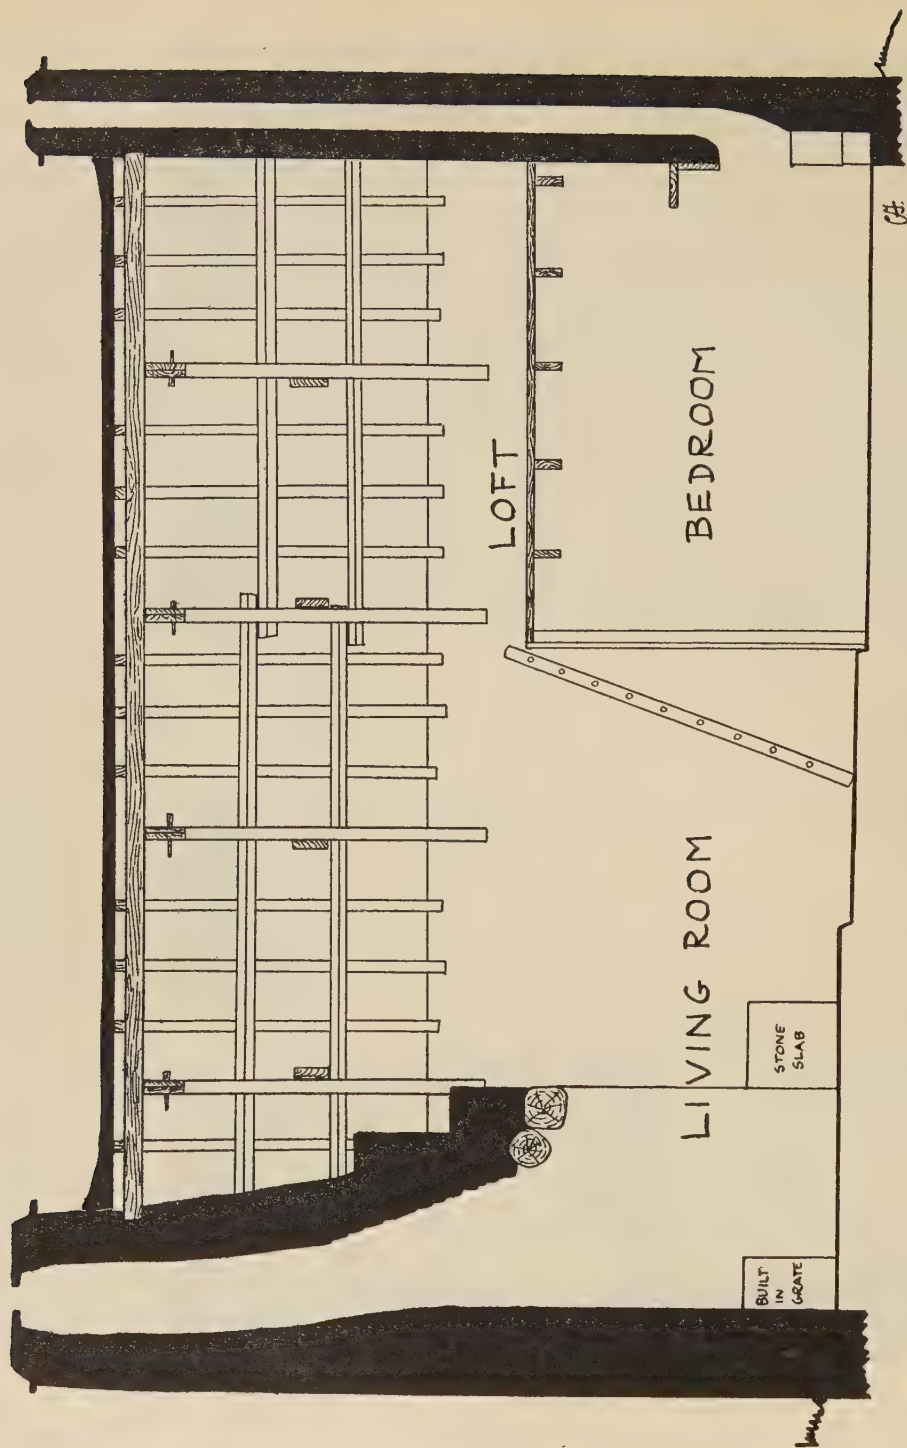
LLAIN-WEN-ISAF : longitudinal section, line A-A' on plan
